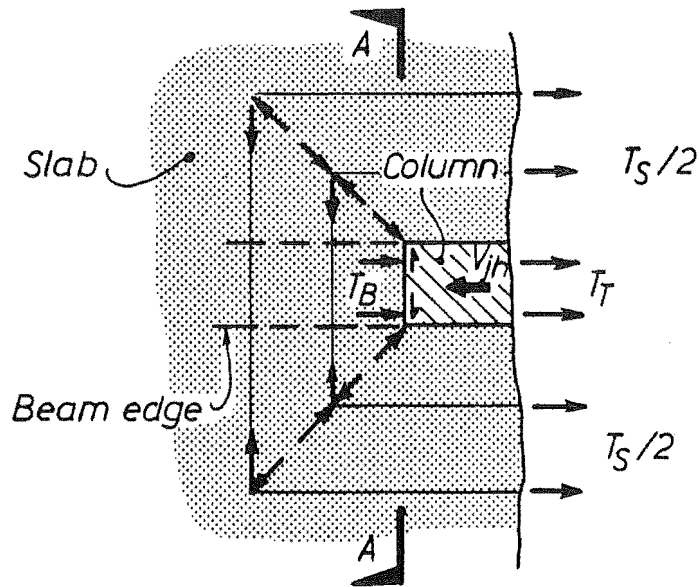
Transfer of Forces to a Beam-Column Joint in the Horizontal Plane Including the Slab Reinforcement.
